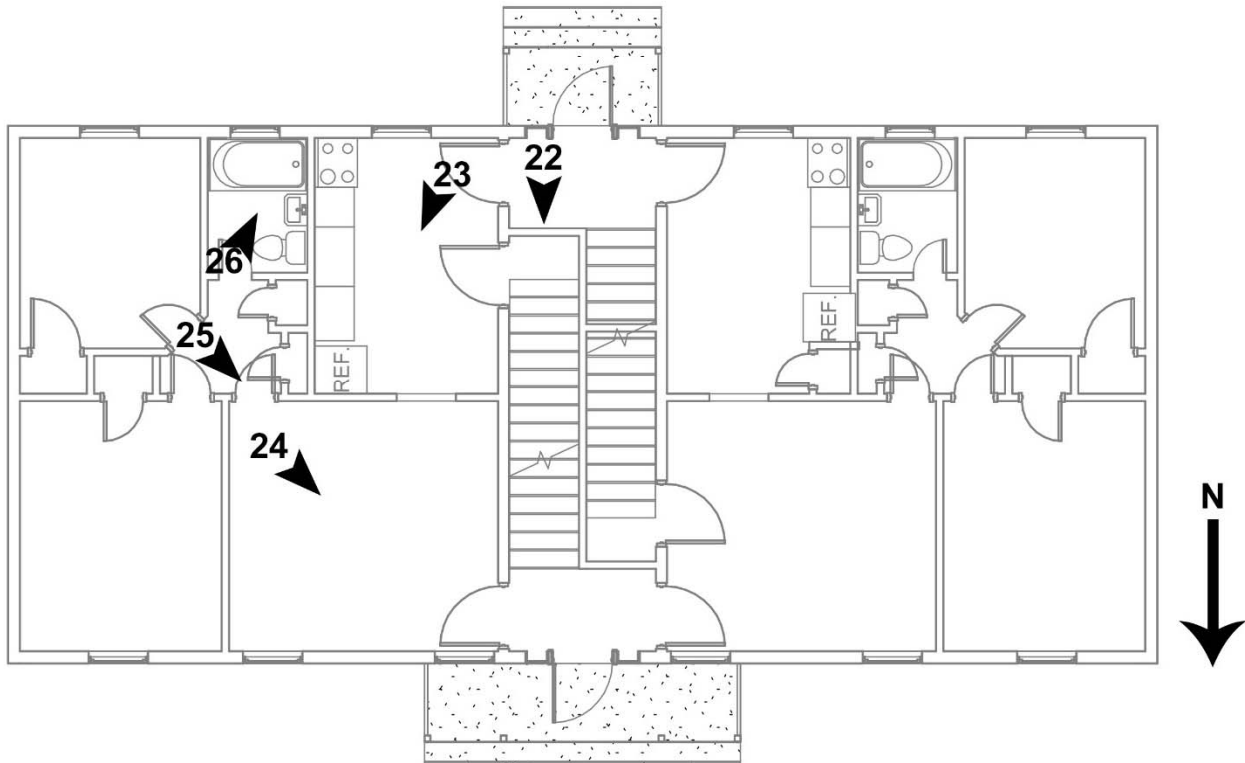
Sunset-Vogue-Blue Ribbon Apartments Historic District, typical three-bedroom apartment building floorplan; photo key.
